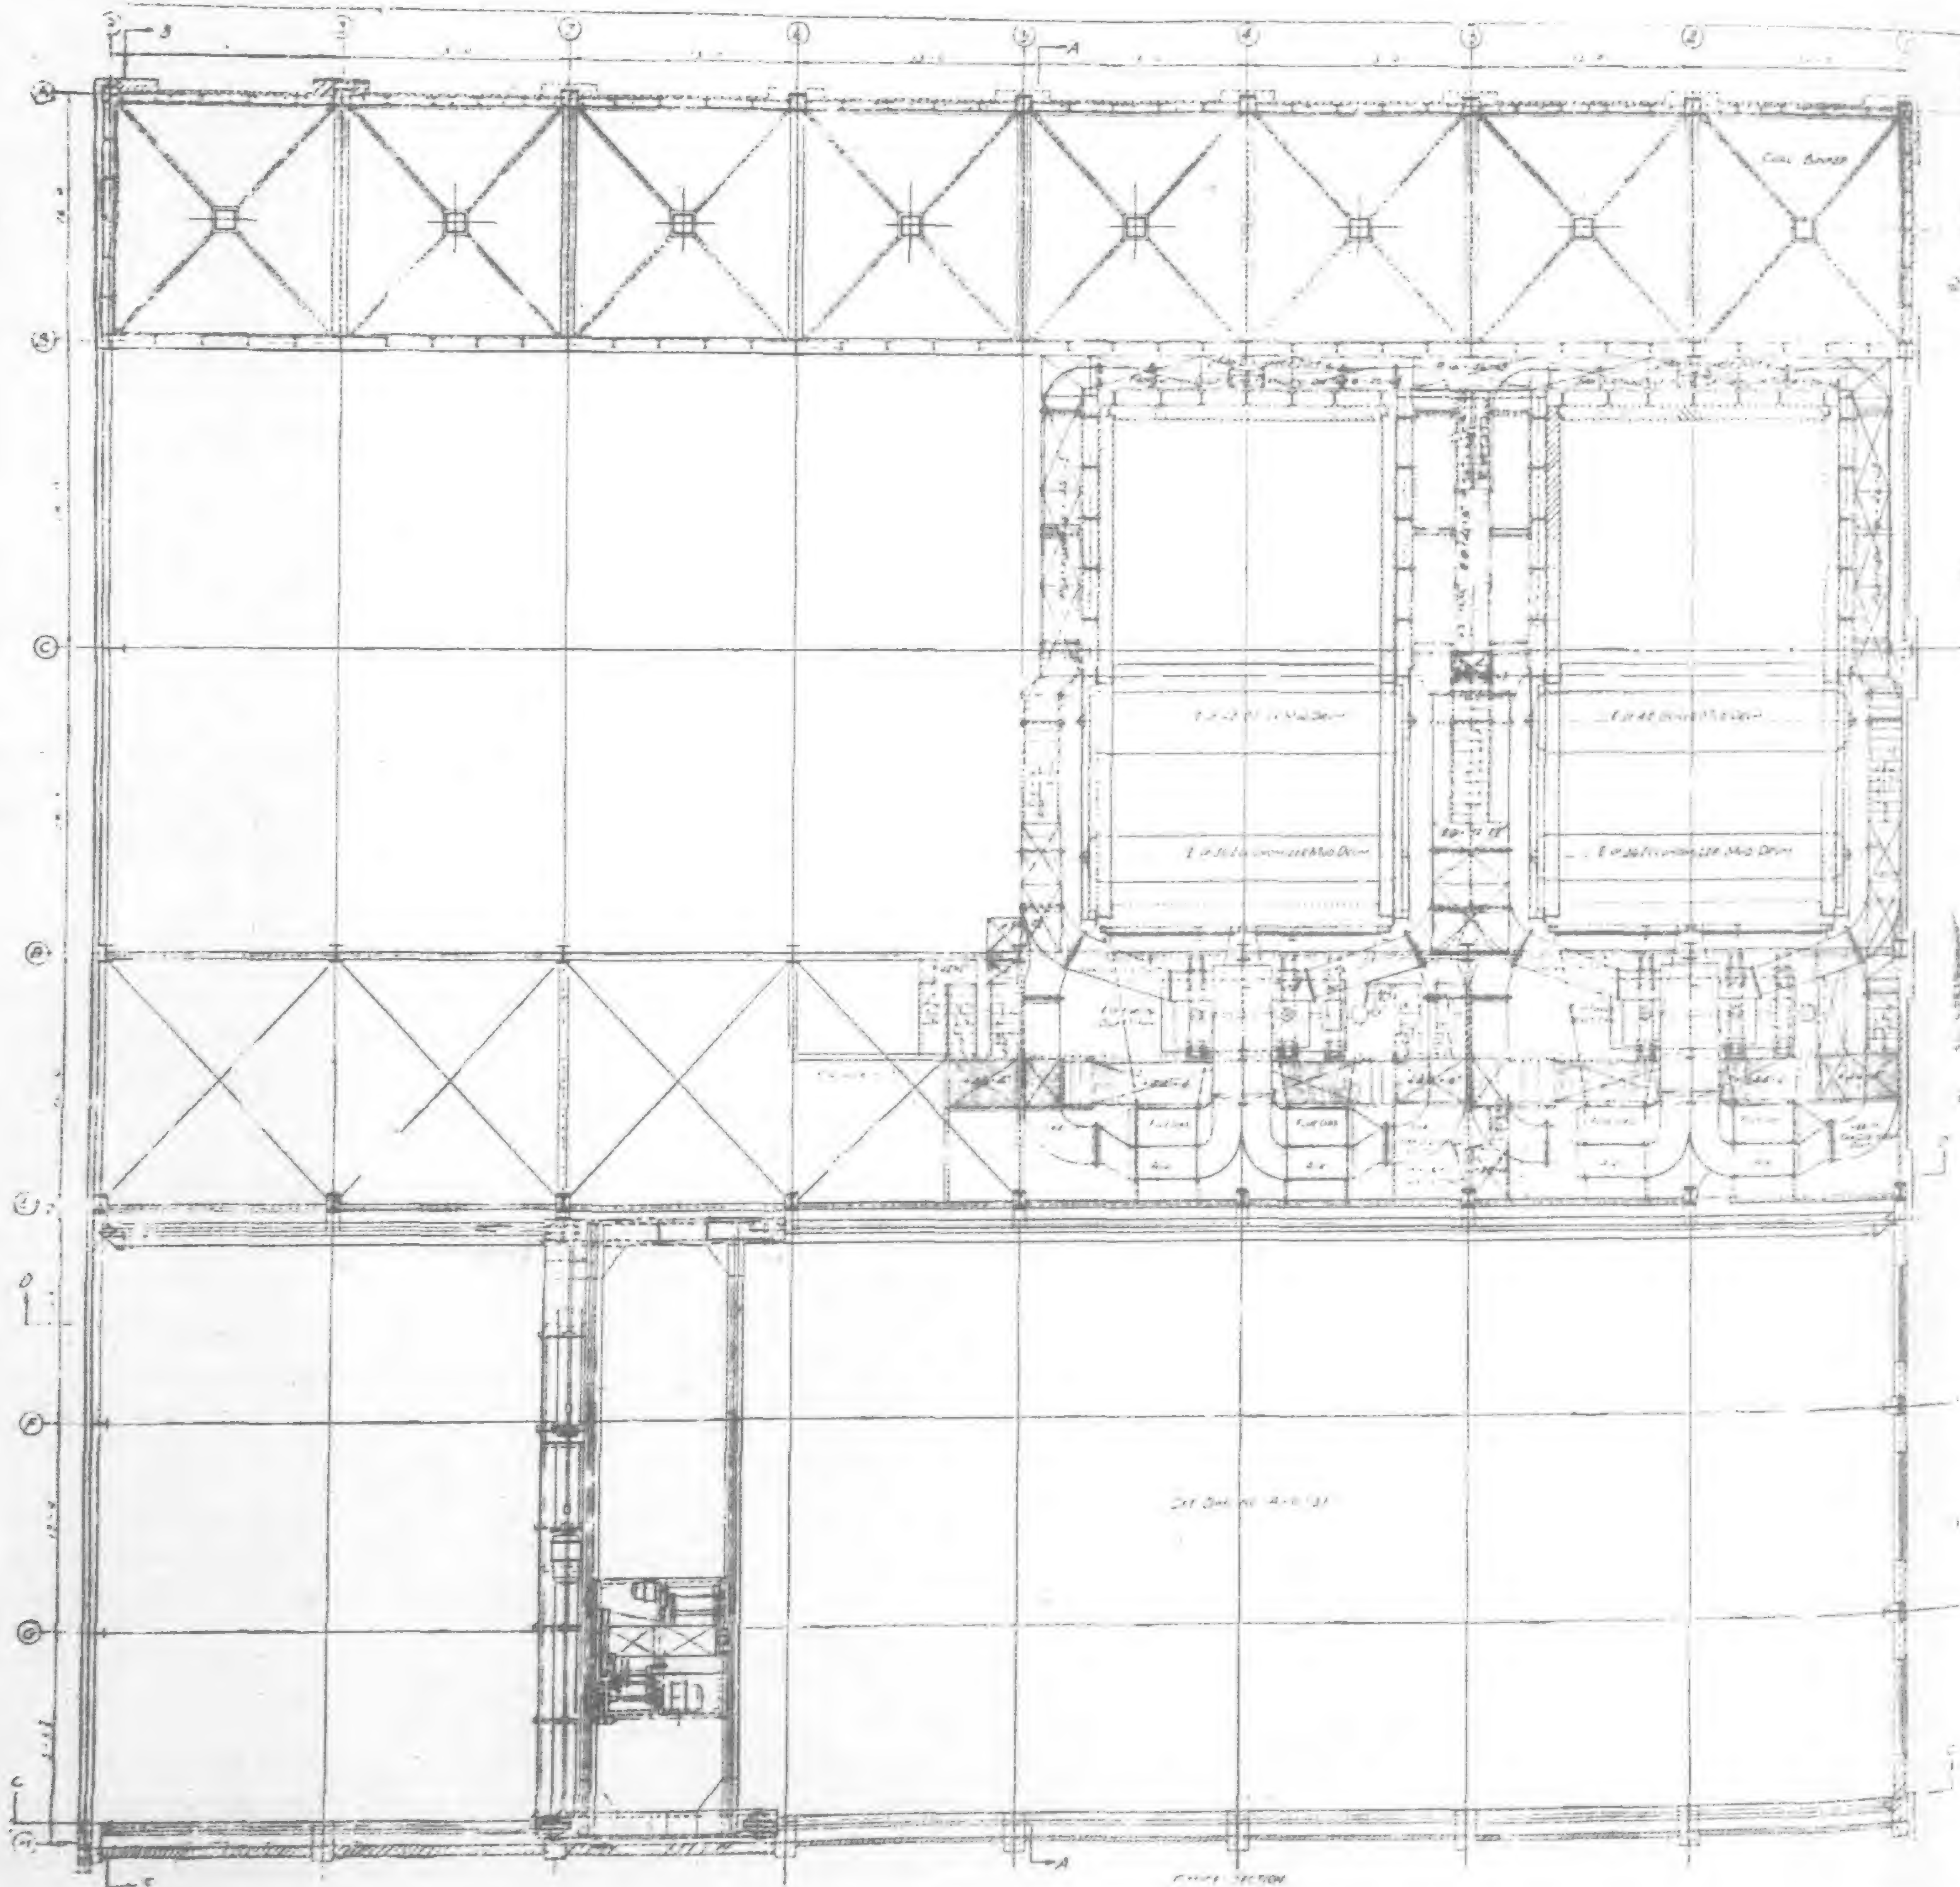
General arrangement, Transverse section Hangchow Power Plant. Scale ¼-in. to 1-ft. Hollis H. Arnold, Consulting Engineer
